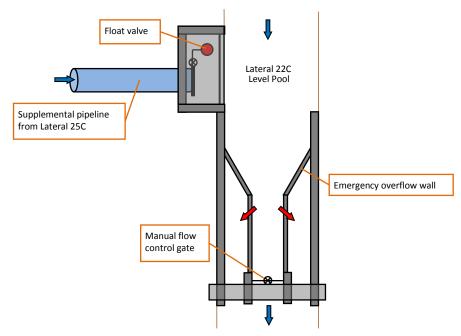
Conceptual plan view of new flow control in Lateral 22C at Ridgeway Road (not to scale)
